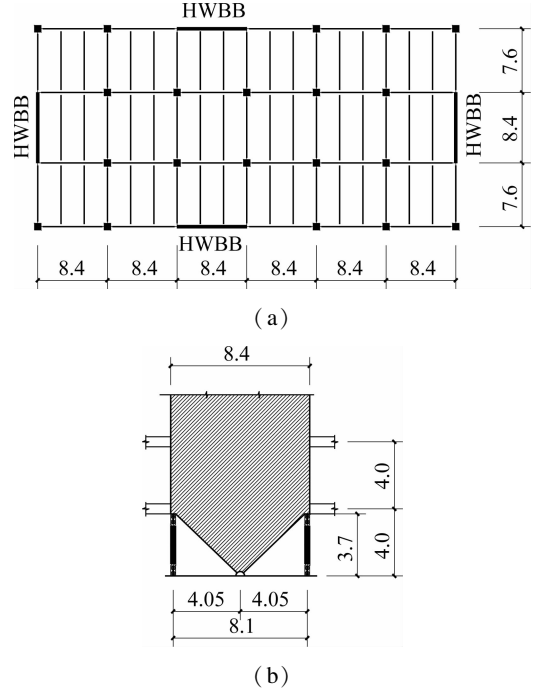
Structural layout of the numerical example (unit: m). (a) Plan view; (b) Detail of HWBB
